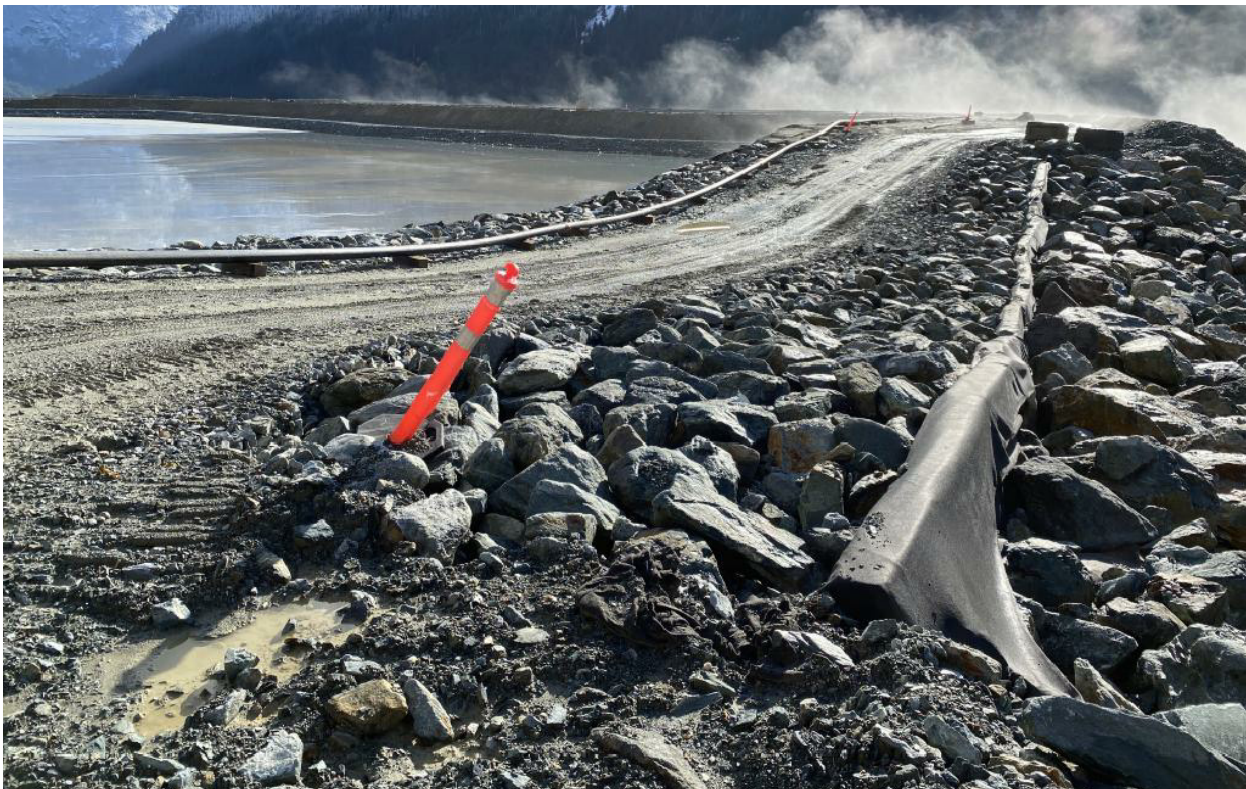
Run-off water through gully on downstream of West Arm abutment tie in, looking north
